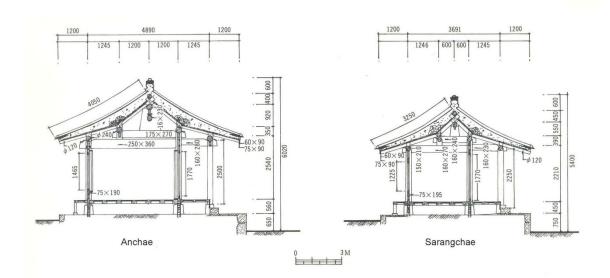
Anchae, Sarangchae Section (N. Zu 2003)
